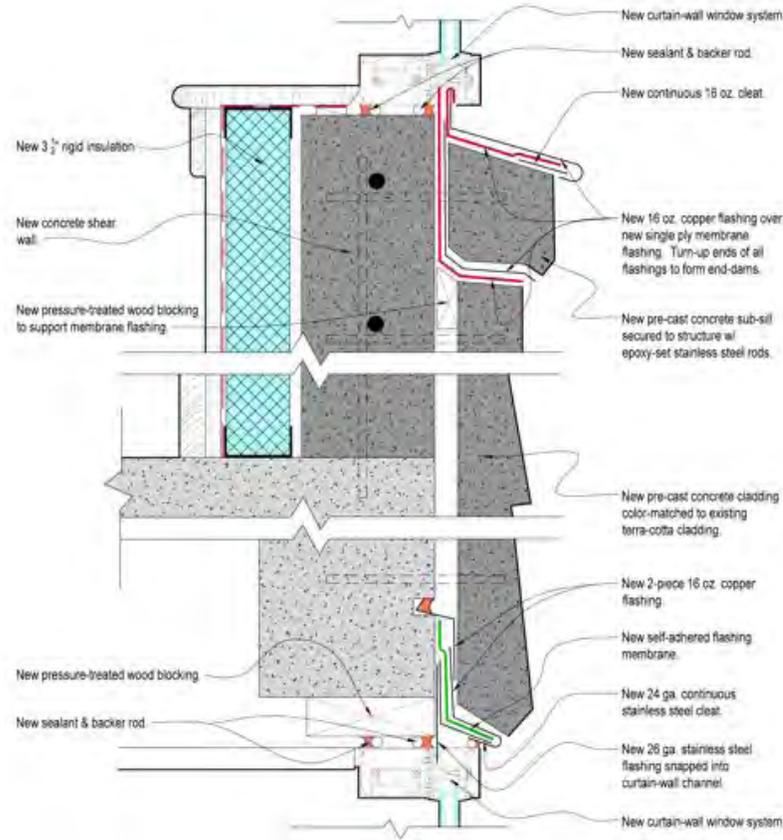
(10): Option 2 New Mas. Veneer Appr. at Typ. Public Façade Windows
